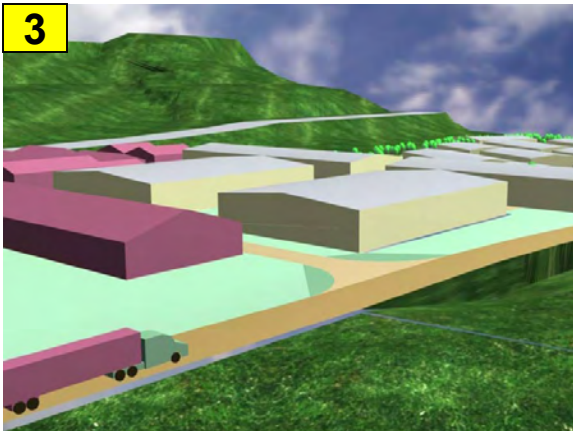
View on the upper portion of the proposed site. The Kapa'a Quarry Access Road is on the foreground with the existing paved road entrance.
